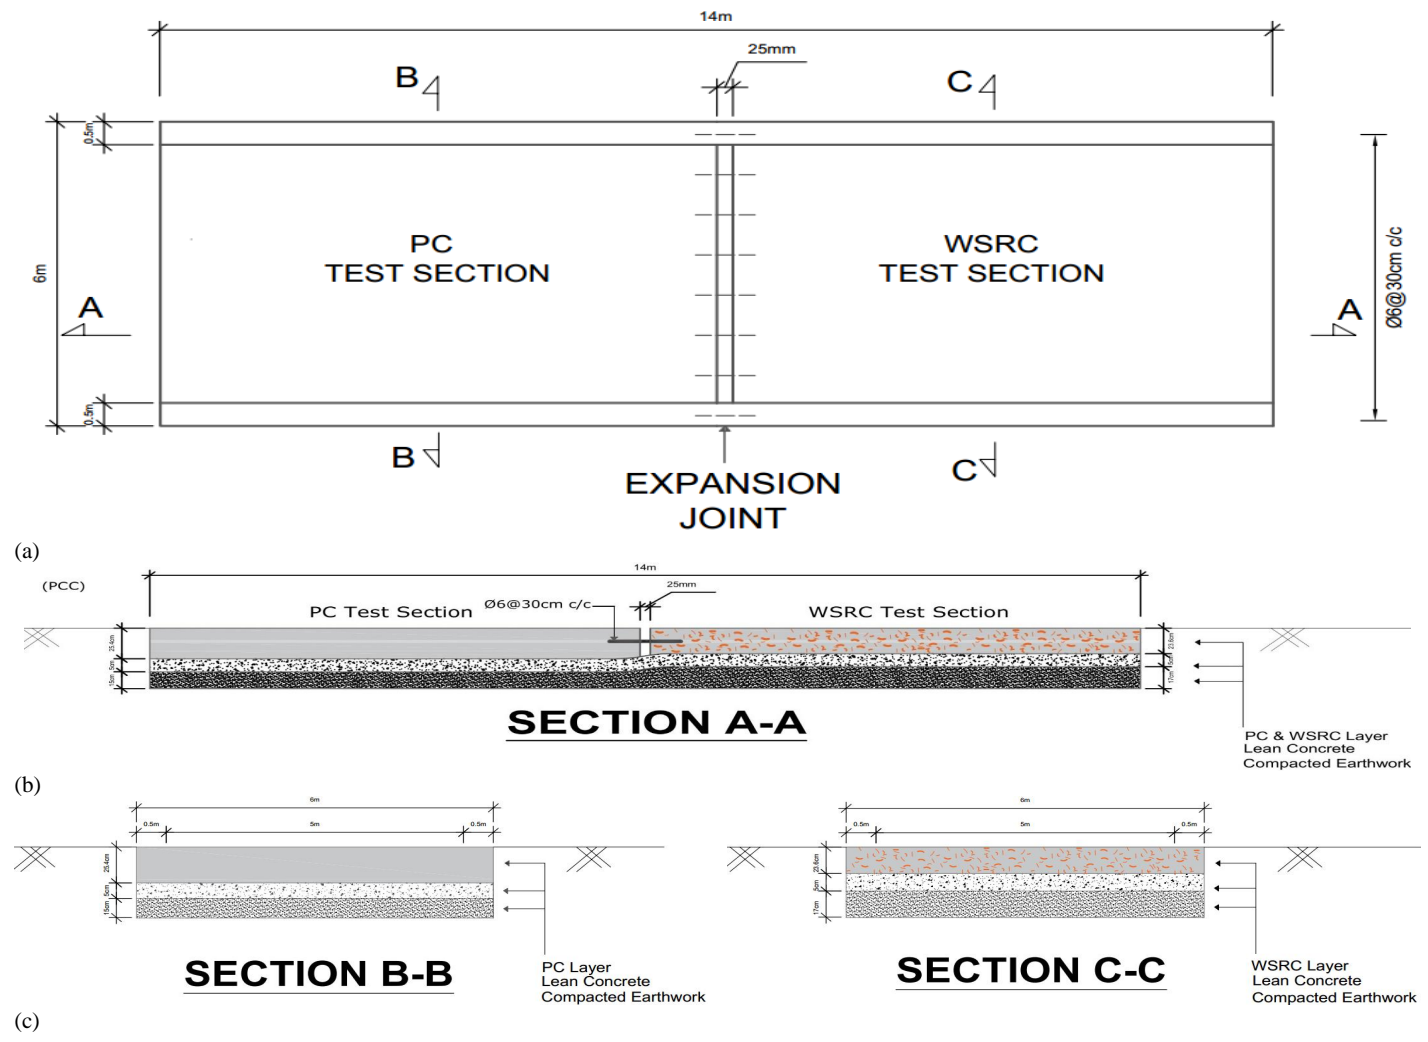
PC and WSRC pavement test sections drawings (a) Plan, (b) Longitudinal section, and (c) Cross sections.
